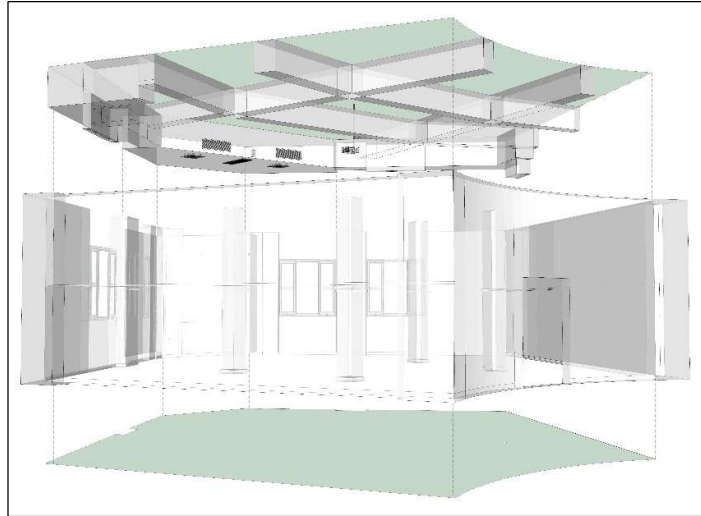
, basement floor - faculty of art & design – blowup plan IDS
